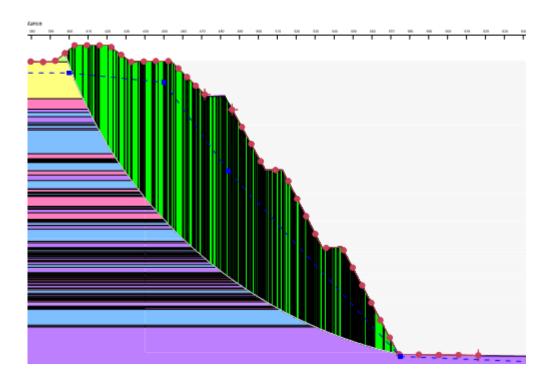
Failure Surface Sect 1C Lower Good Blasting Piez Surface
